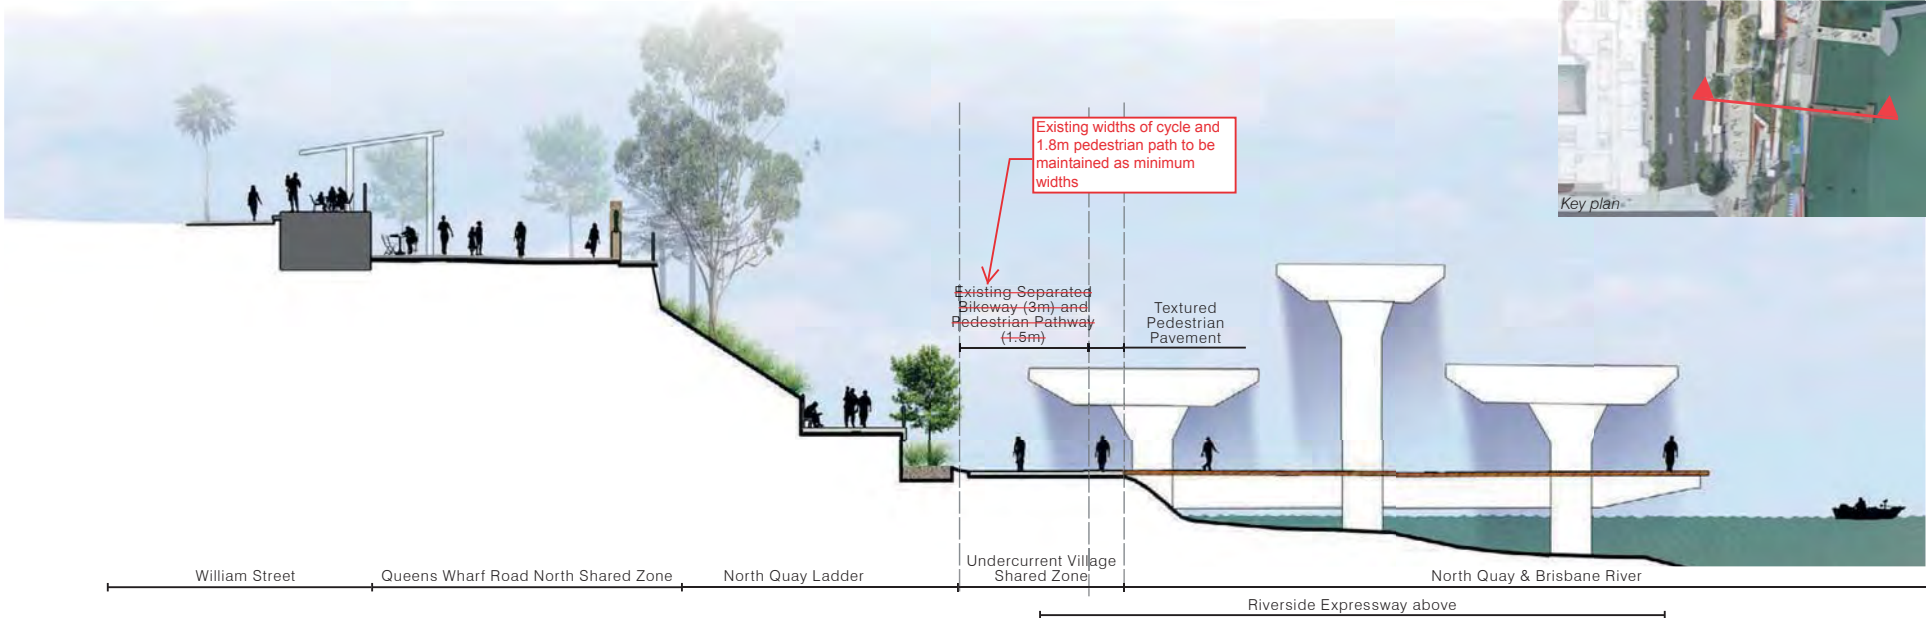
Existing Bikeway Typical Sectional Elevation (Not to scale)
